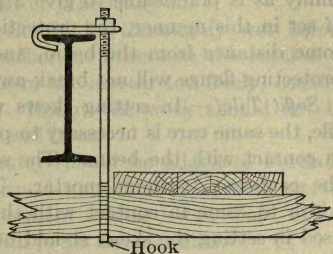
Detail of Centers for Hollow Tile Flat Arches.
